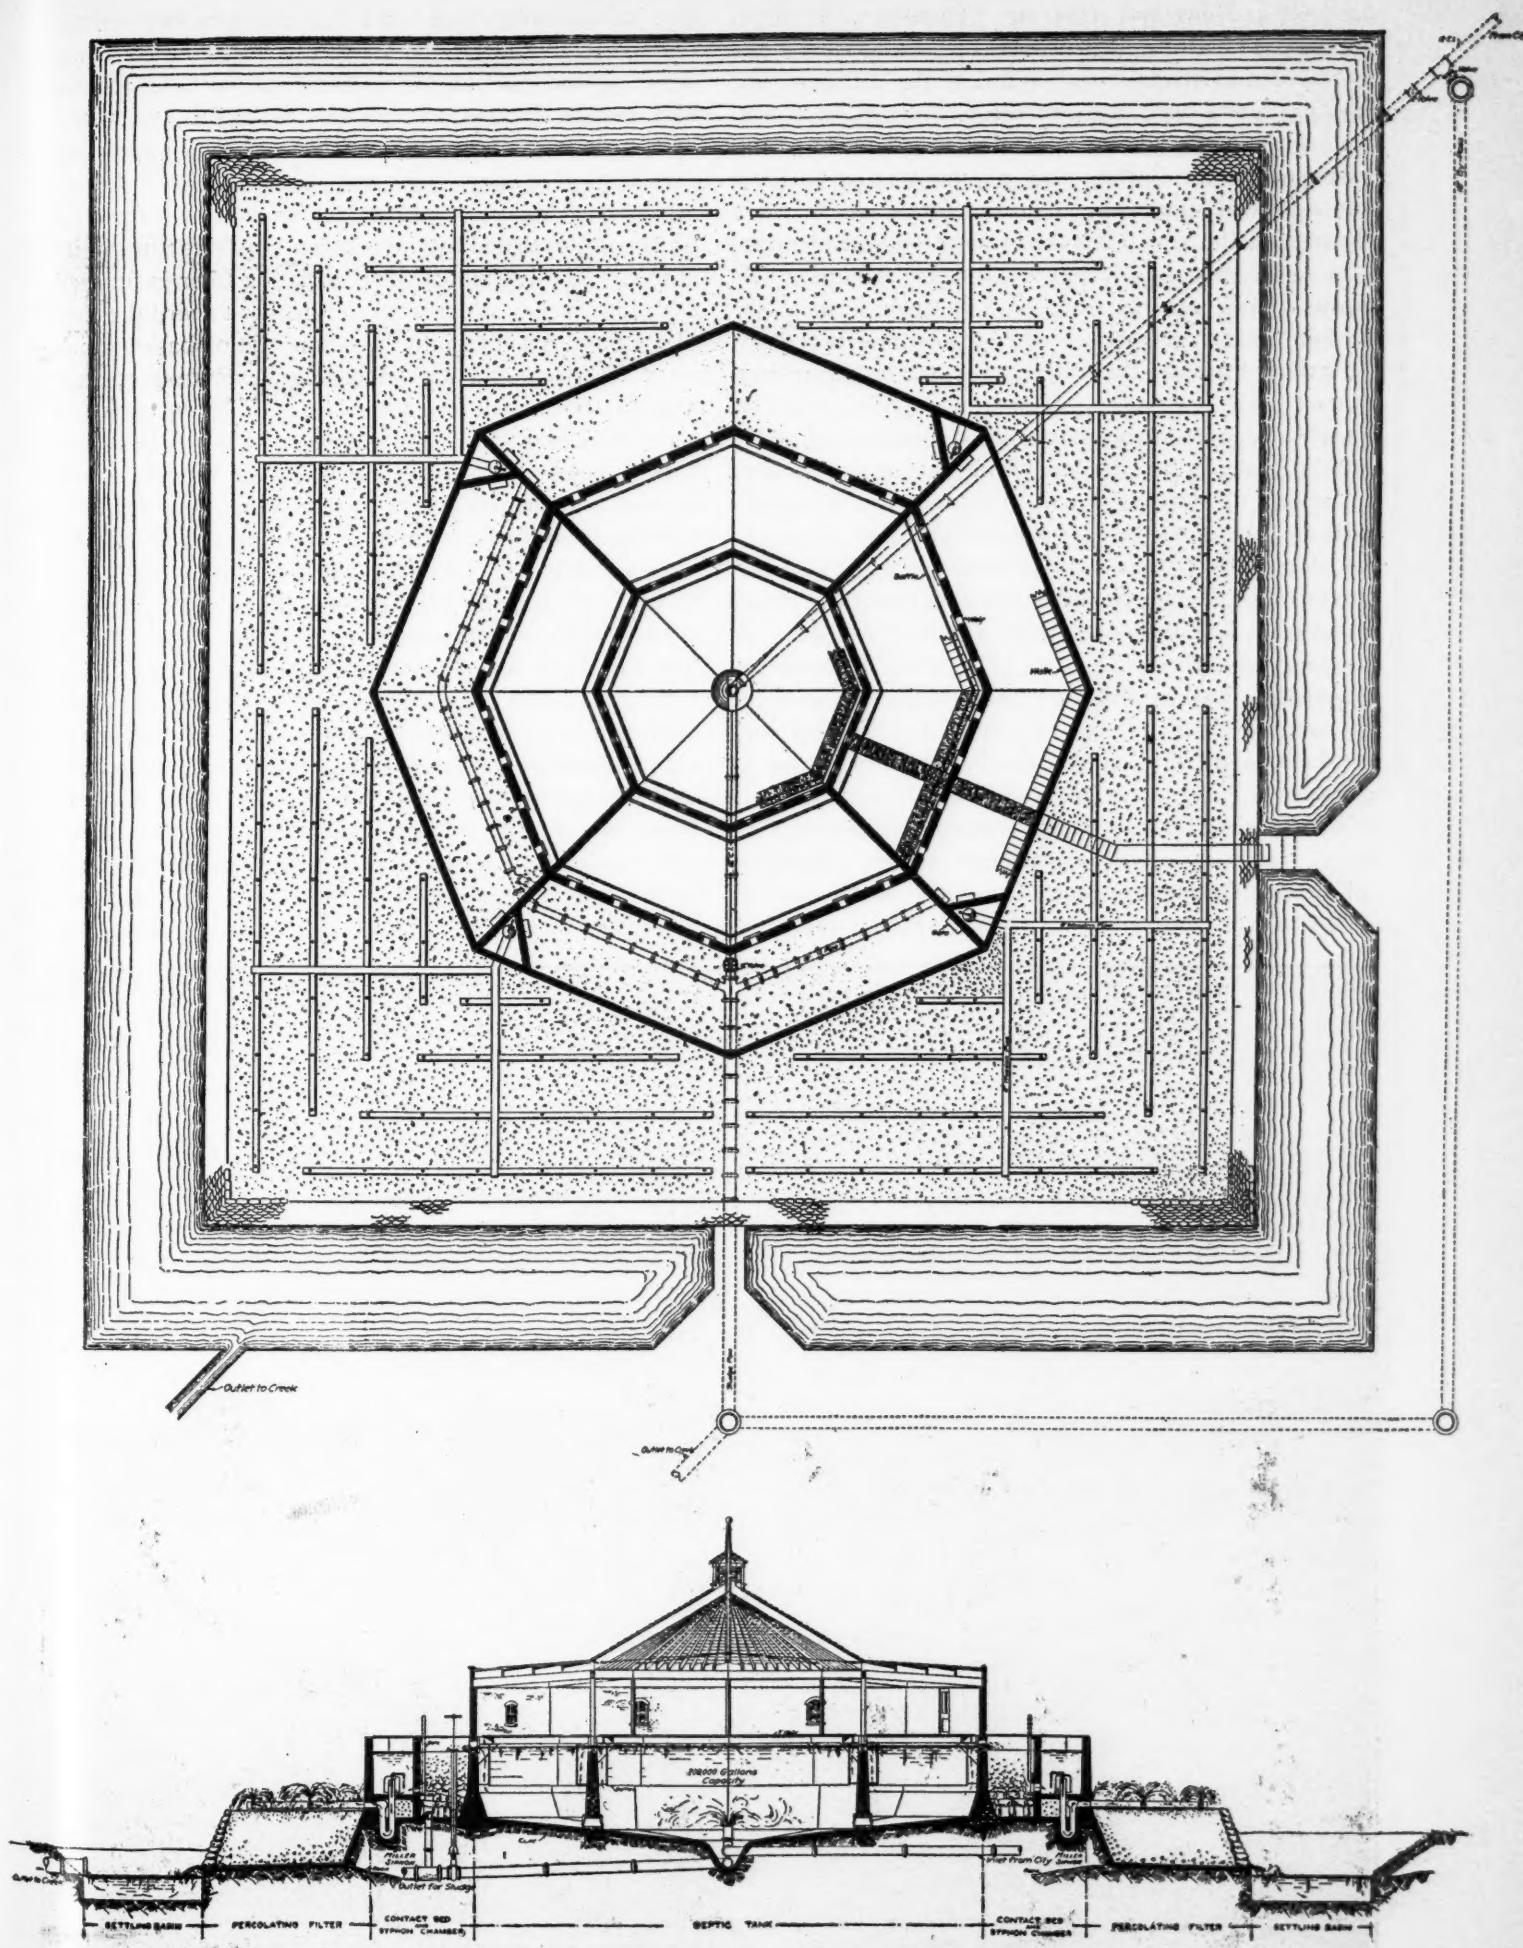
PLAN AND CROSS-SECTION OF SEWAGE PURIFICATION PLANT AT BLOOMINGTON, IND.
